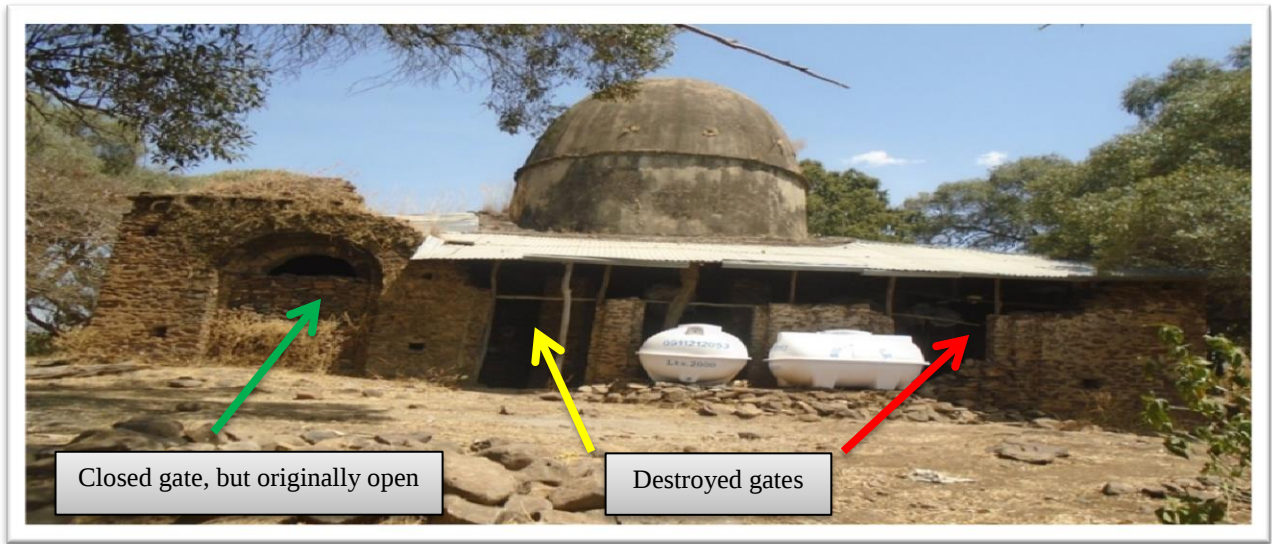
Southern face of the Building (Photo by Kedir 2018)
